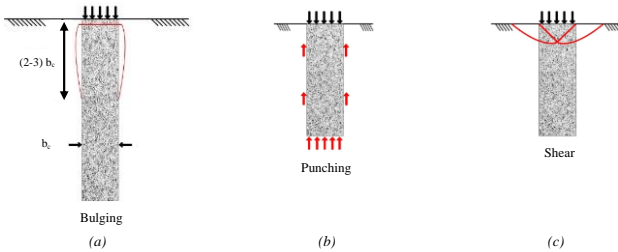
The failure modes for stone columns and aggregate piers.
